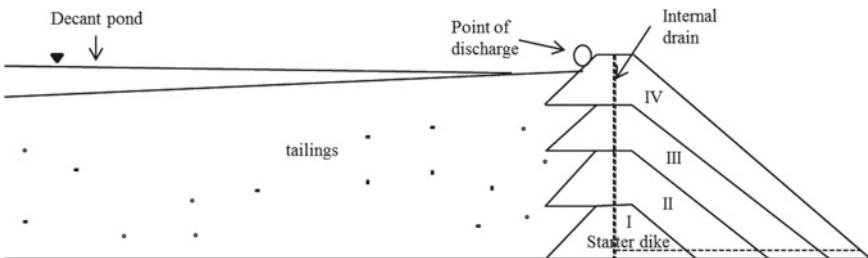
Centreline method of tailings dam construction (recreated after [12])
